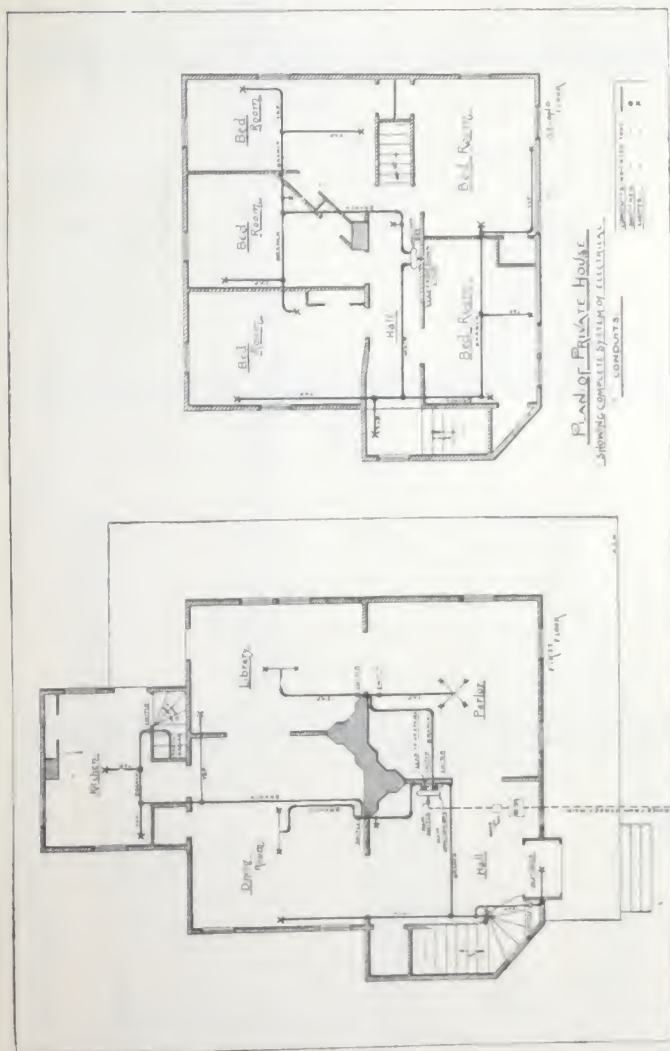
Illustrates plans of house with the conduits laid out showing an outlet and lights for each room.
